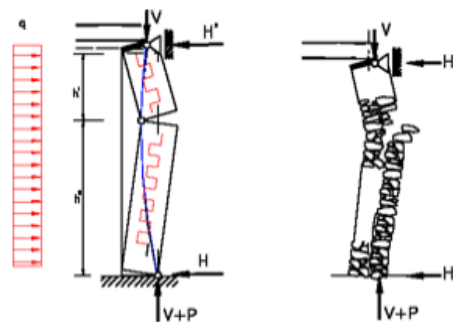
Vertical bending and damage of a multiple leaves wall (Borri et al. 1999).
